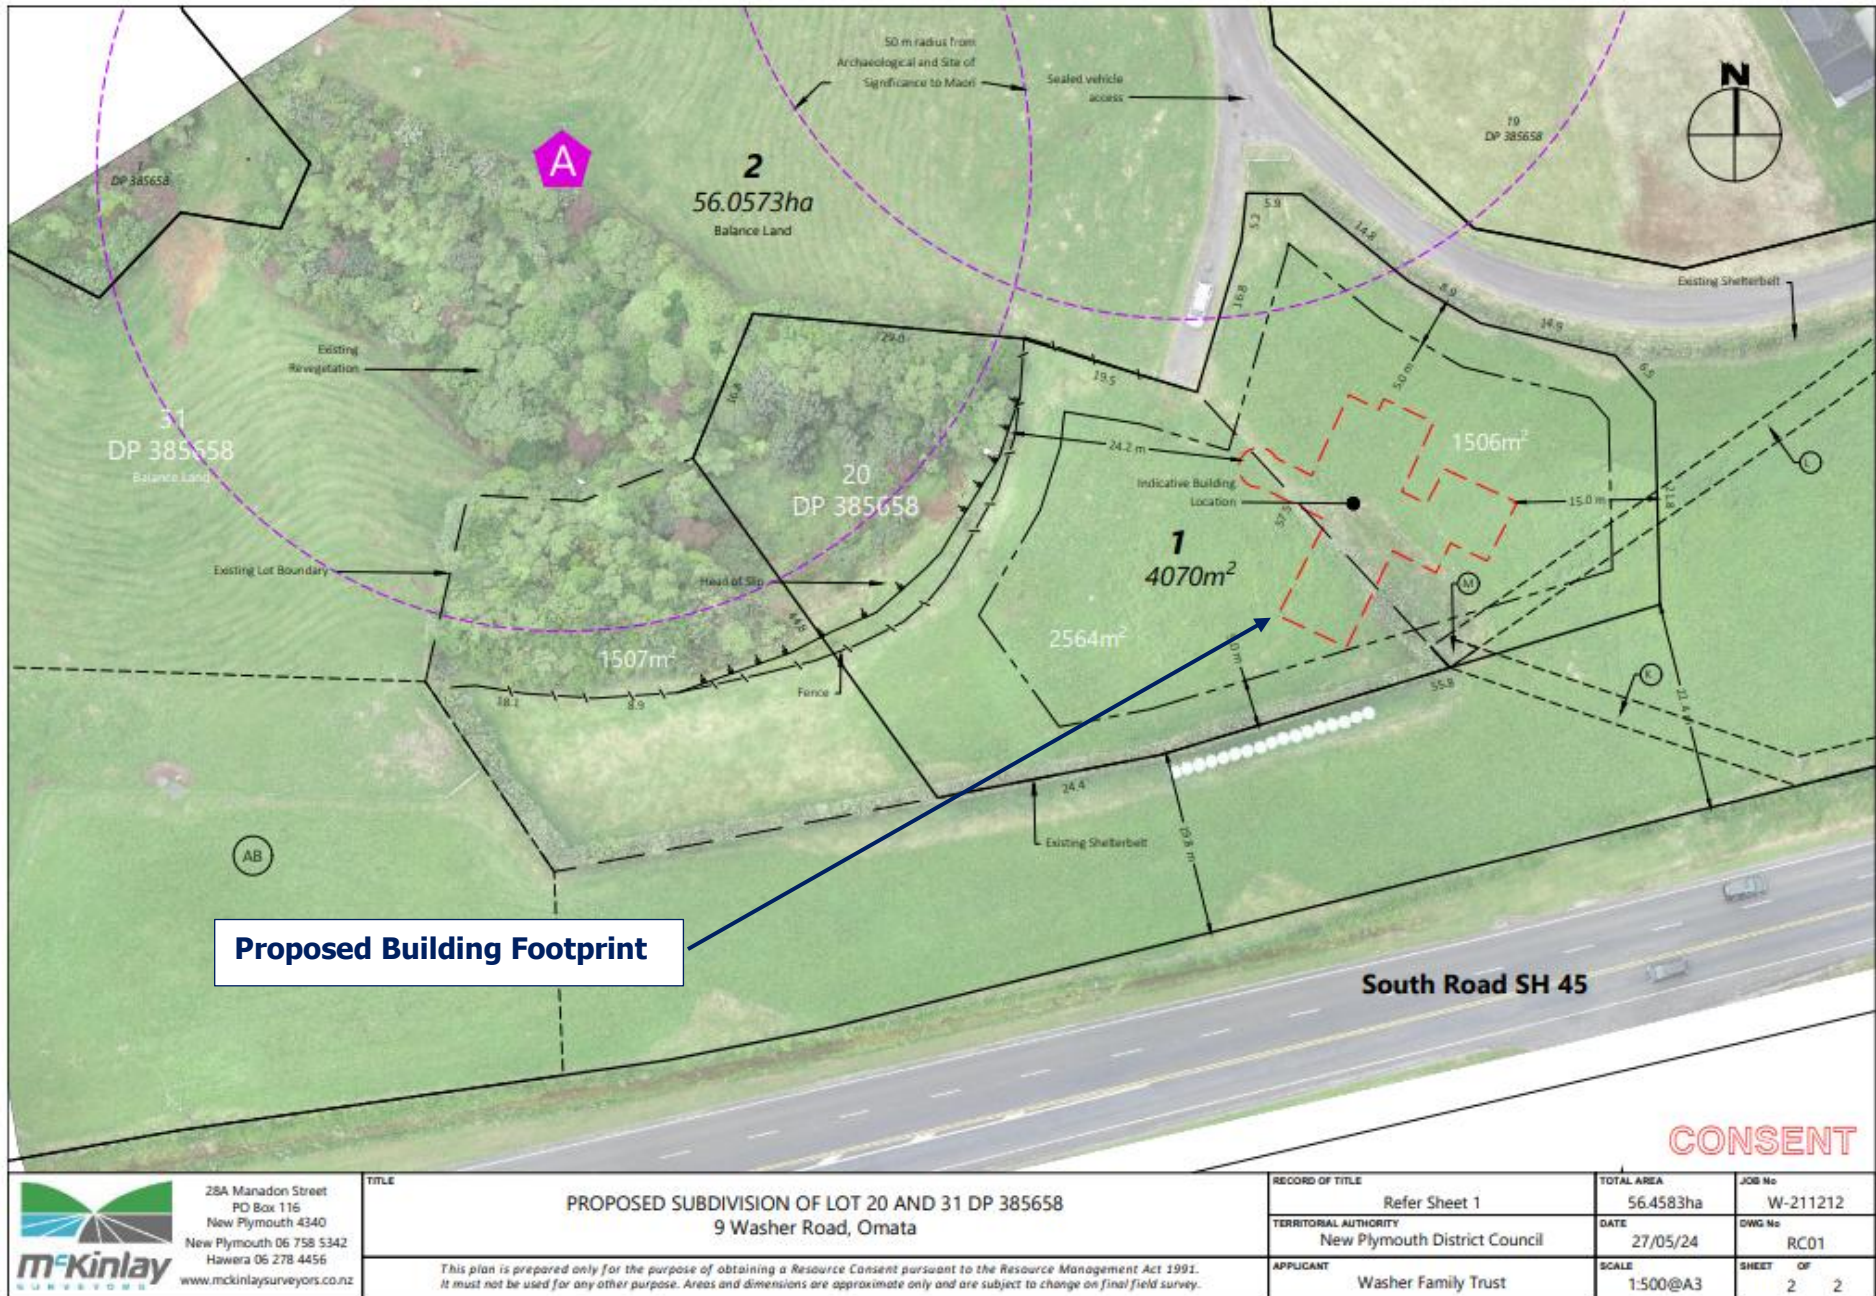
Proposed Site Plan. Source: McKinlay Surveyors.
